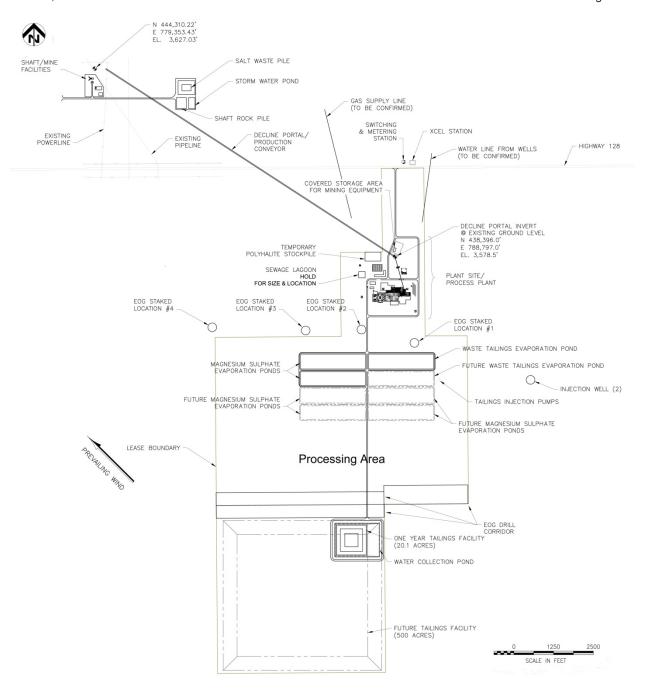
Overall Site Plan of Process Plant and Mine Site
